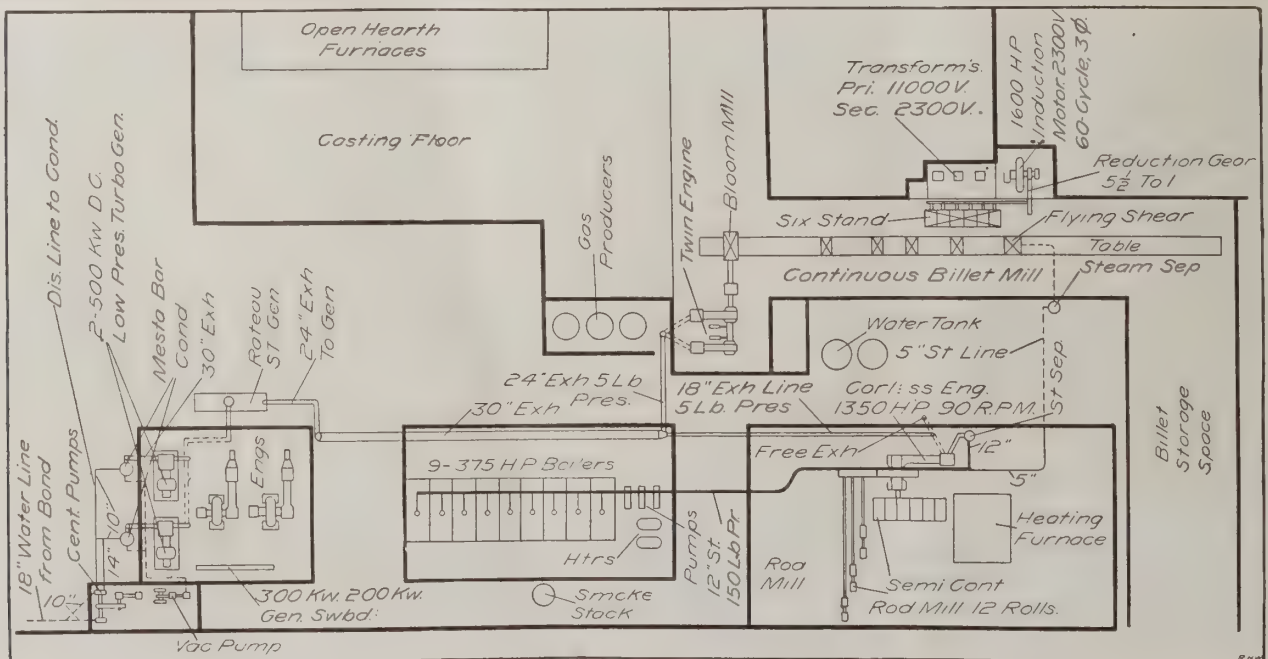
GENERAL PLAN OF PLANT, SHOWING ARRANGEMENT OF ENGINES AND TURBINES.
